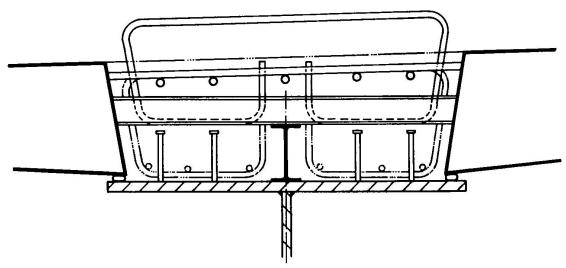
In this solution, independent elements of the precast slab, connected by steel beams, are supported by vertical plates.
